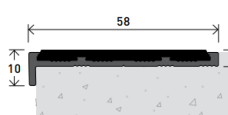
(B) A TYPICAL STAIR NOSING PROFILE WITH EXPOSED NOSING STRIP
